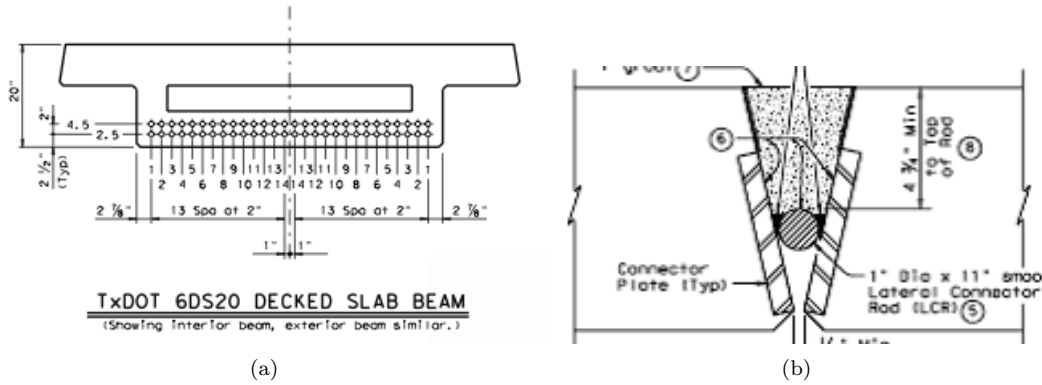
Decked slab beam section (Texas) (TxDOT, 2010)
